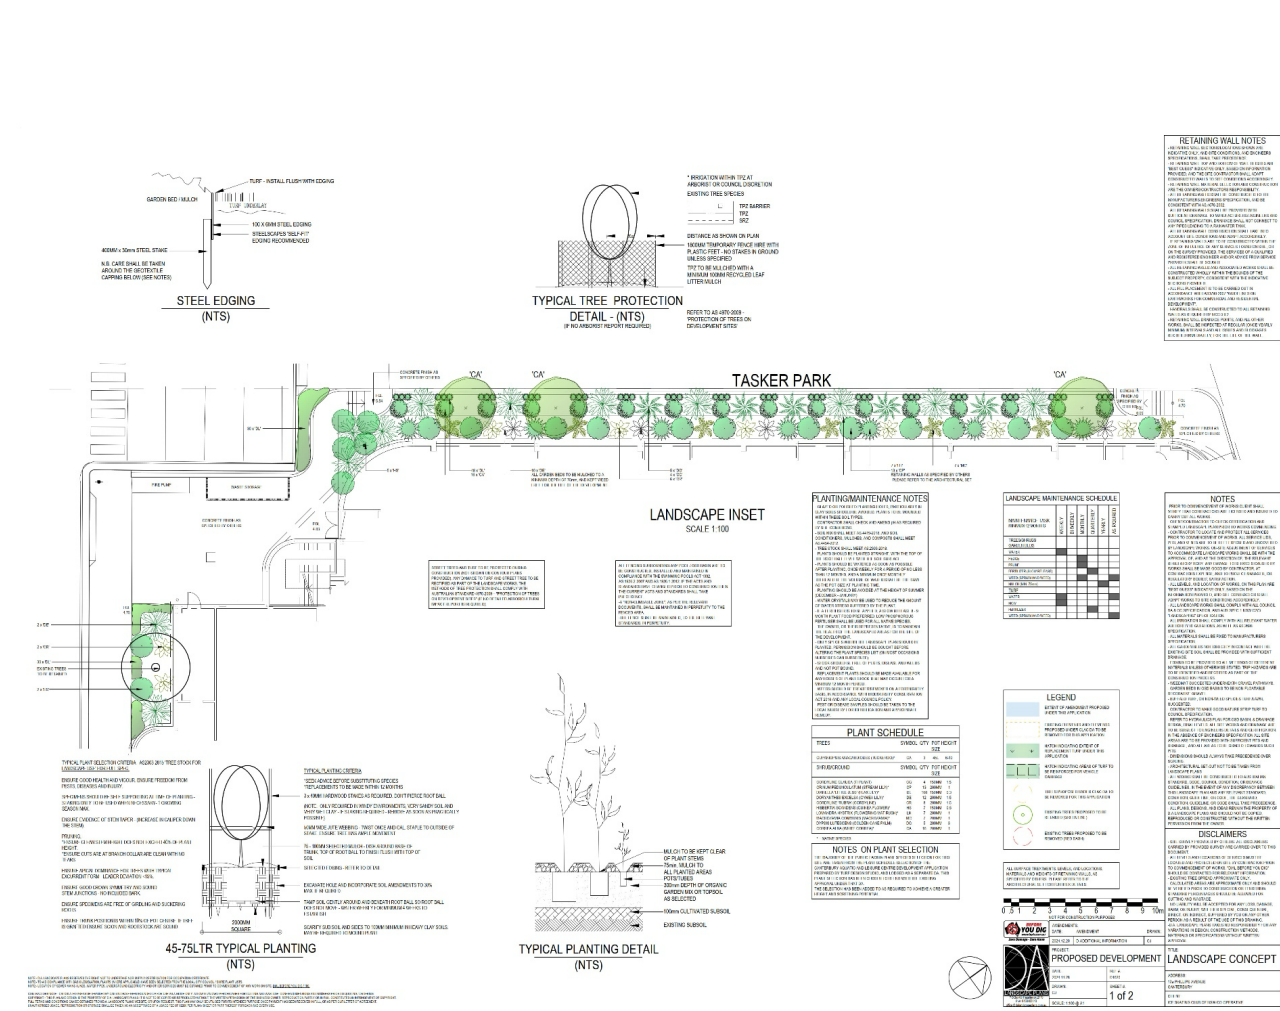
Proposed Landscape Plan (Source: DA Landscape Plans 2024)
